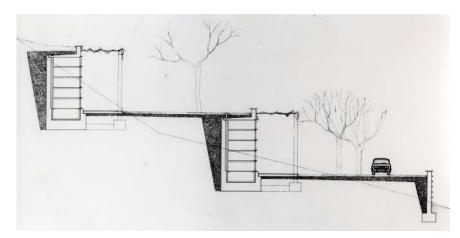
Terrace Section, paths with pavements and a plantation of trees, by Enric Batlle, 1985
